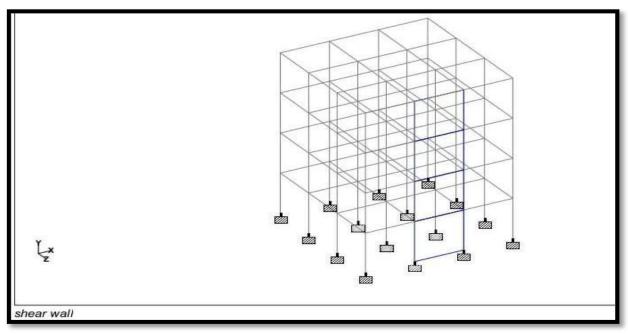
Analysis done in STAAD PRO DESIGN OF SHEAR WALL
